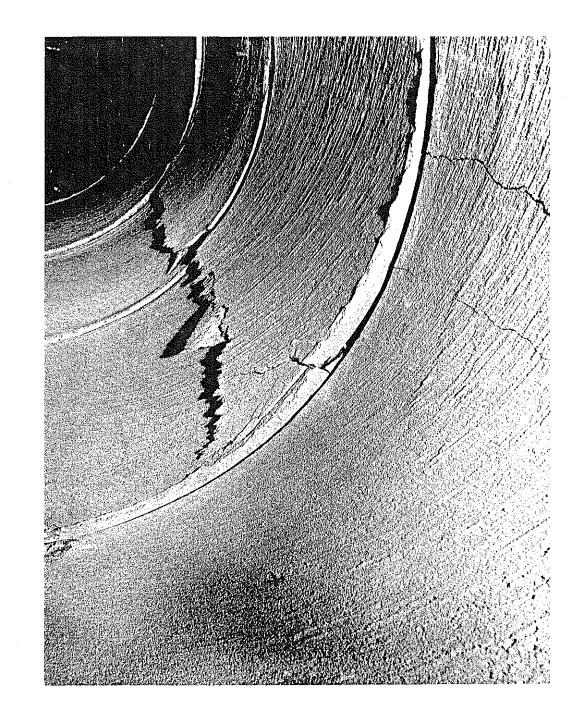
Failure in Top of 60-inch Culvert Under a 28-foot Fill, Station 1619 + 45L, 164-3(7)35, Shelby County
